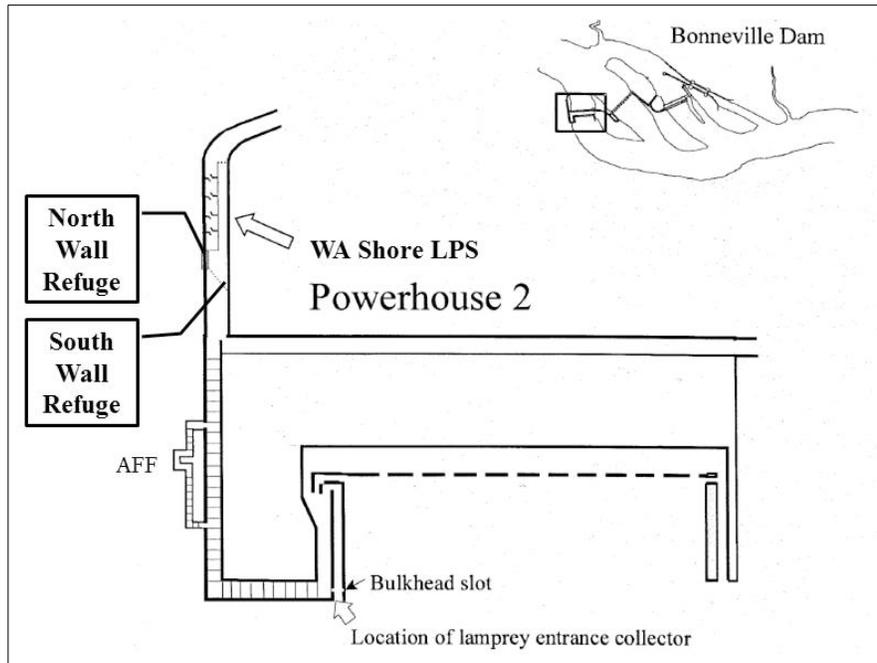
Location of refuge boxes at north and south walls of Washington Shore AWS channel.
